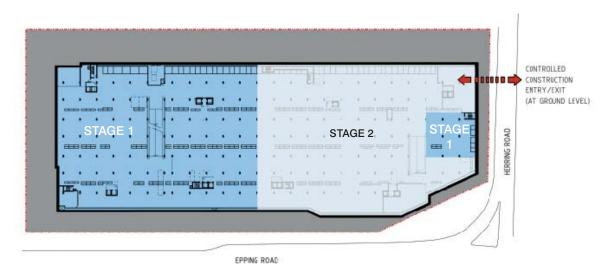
Stage 1 - Excavation and construction of the basement levels
